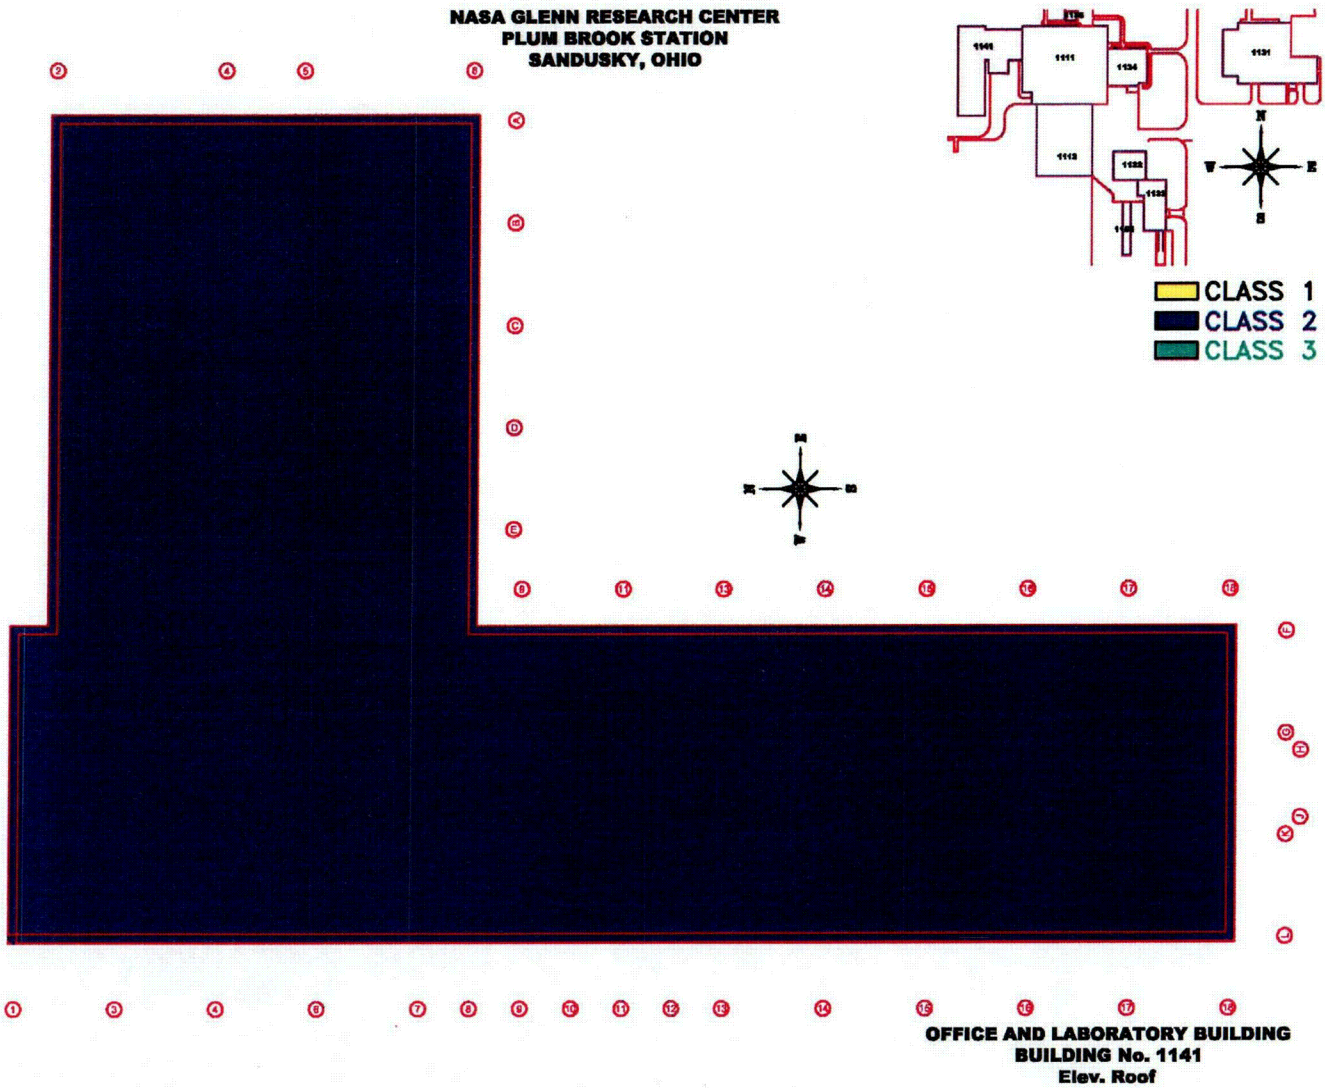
Reactor Office and Laboratory Building Roof Elevation
